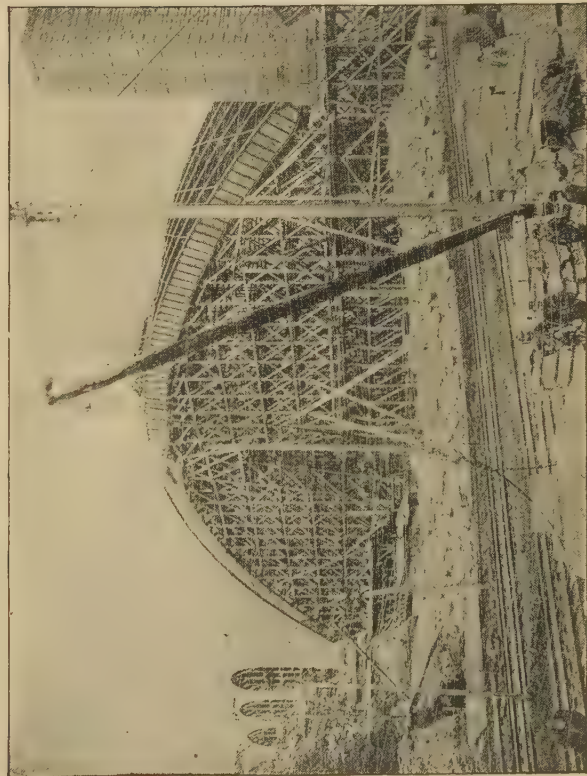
WASHINGTON BRIDGE OVER THE HARLEM RIVER.
